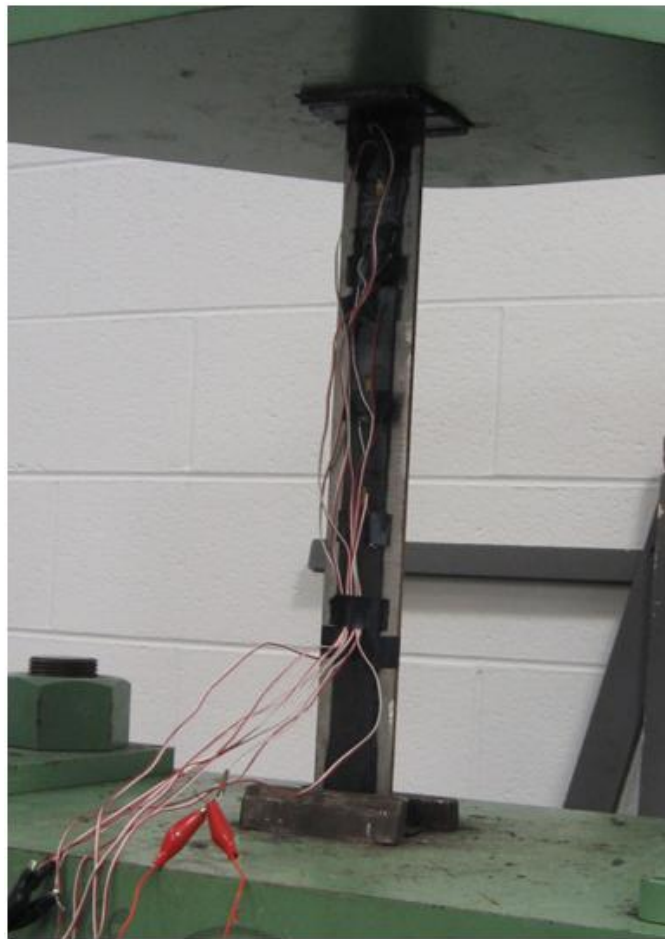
Testing of Doubly Reinforced Steel Plate Specimen
